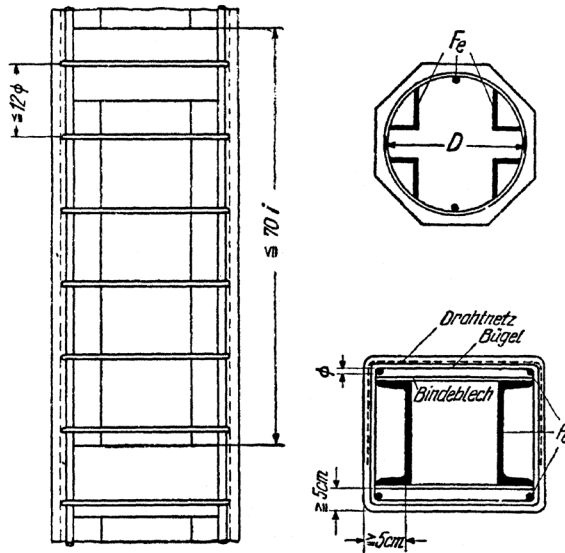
Columns reinforced with Structural Steel (DIN 1045-1943, Fig. 23)
